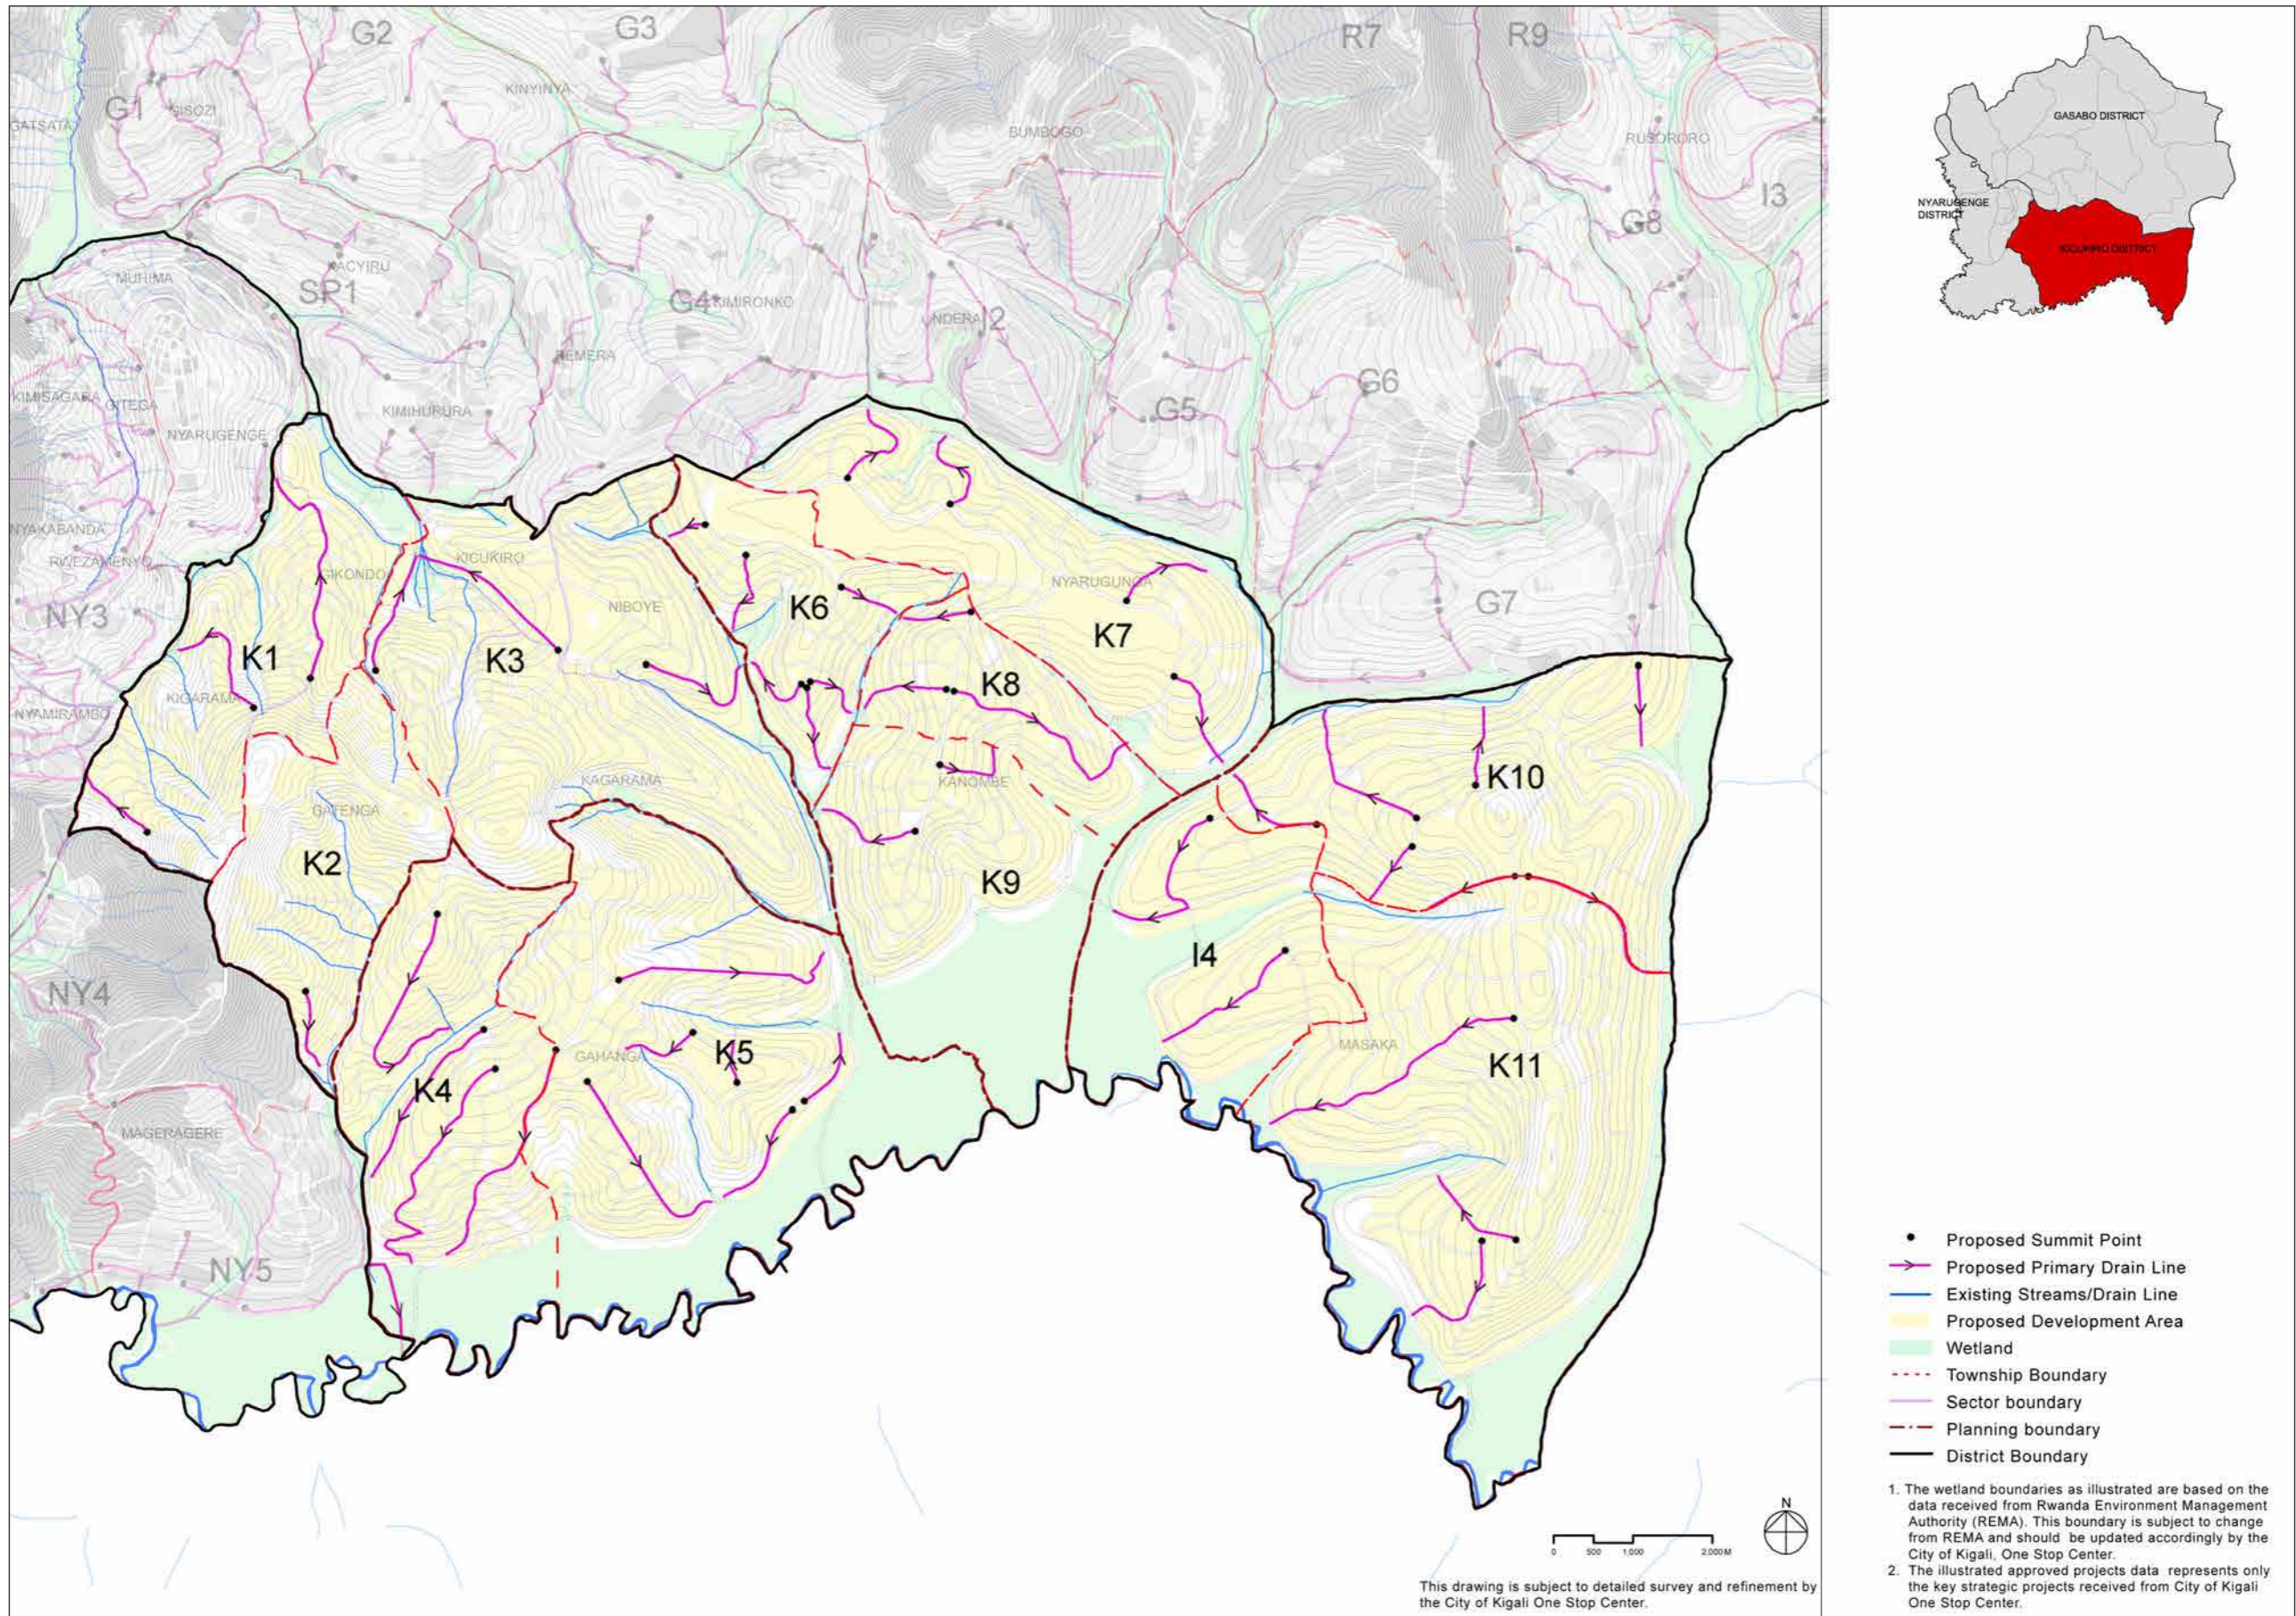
Kicukiro District - Proposed Drainage Plan - Year X
